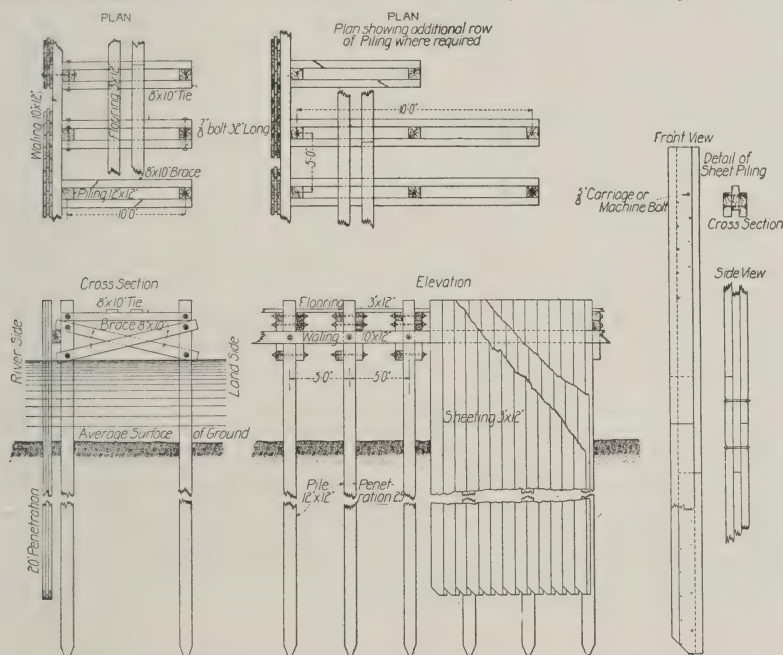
Details of Timber Dam at Hymelia Crevasse, Louisiana.
